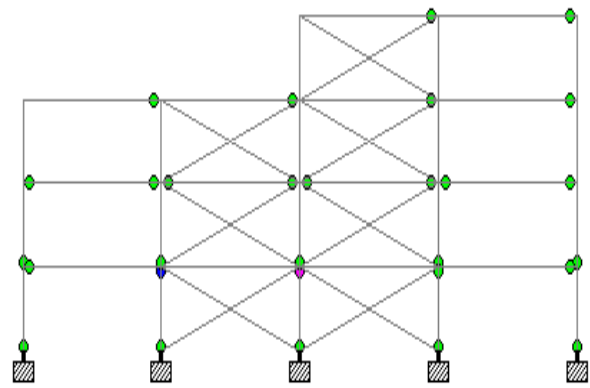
Members of Externally Braced Steel Frame in LS-CP
